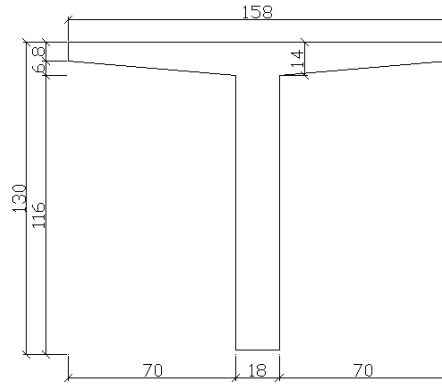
Geometric size of the Long Tan bridge T-beam (cm)
